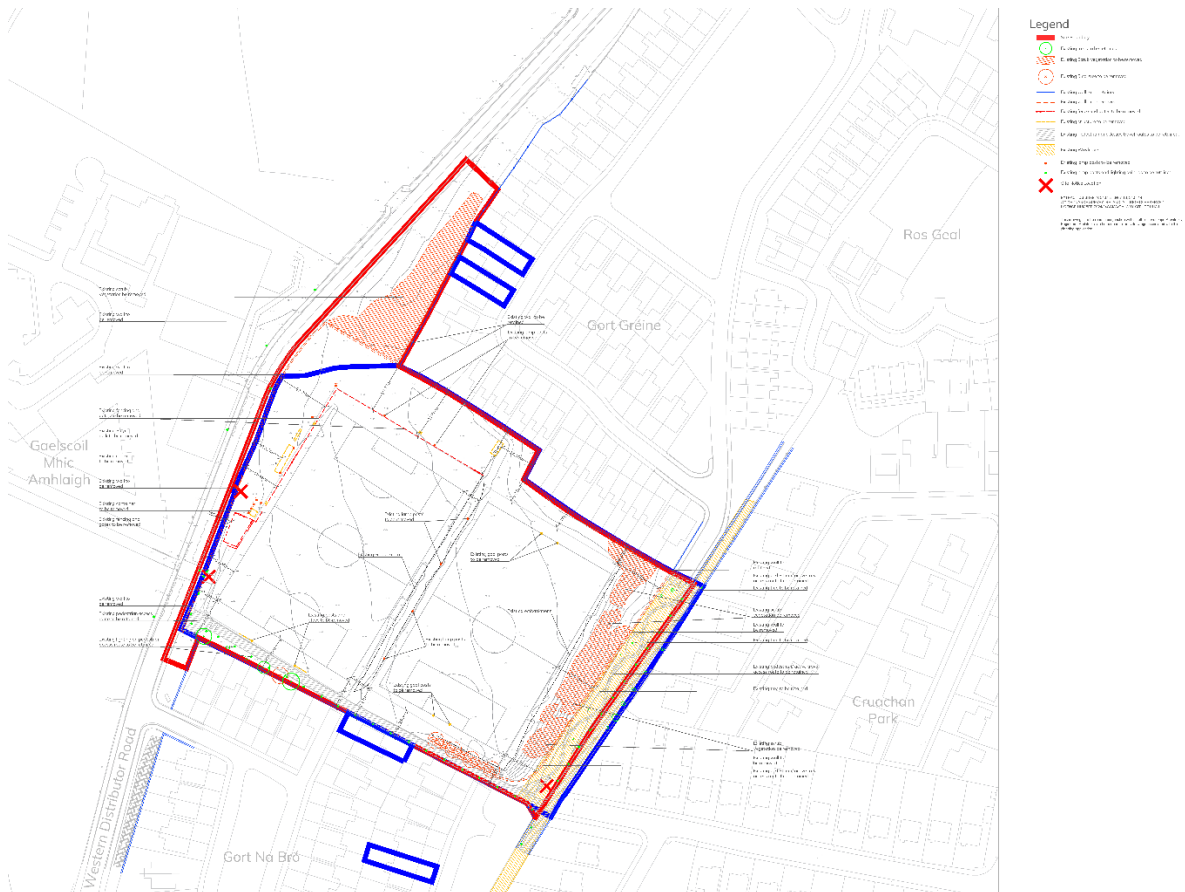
Existing Site Layout Plan of Millers Lane (Detail of Drawing P612-MIL-LD-SU-002)
